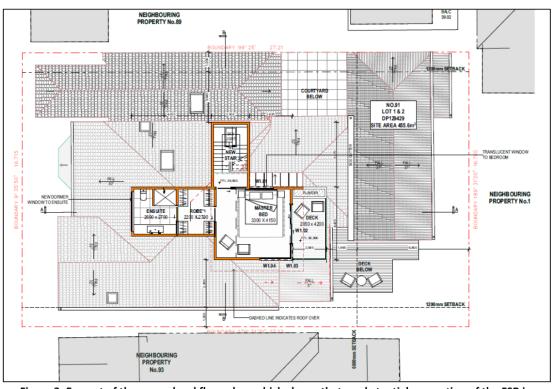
Excerpt of the upper-level floor plan, which shows that a substantial proportion of the FSR is contained within the roof space whilst the limited footprint and substantial setbacks from adjoining properties are also evident
